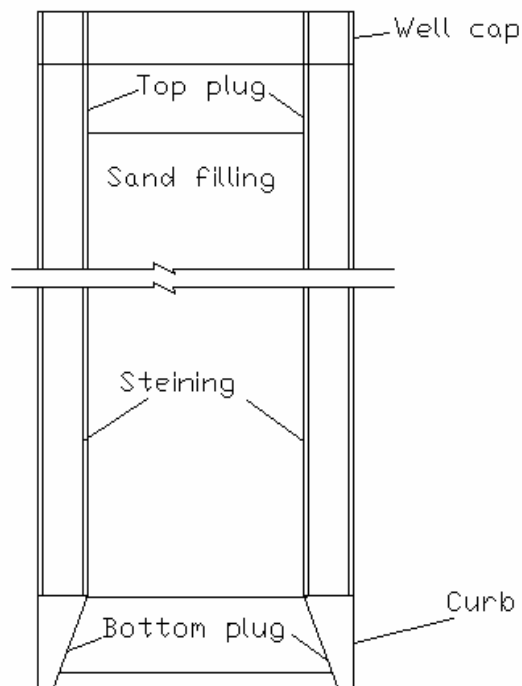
COMPONENTS OF WELL FOUNDATION
